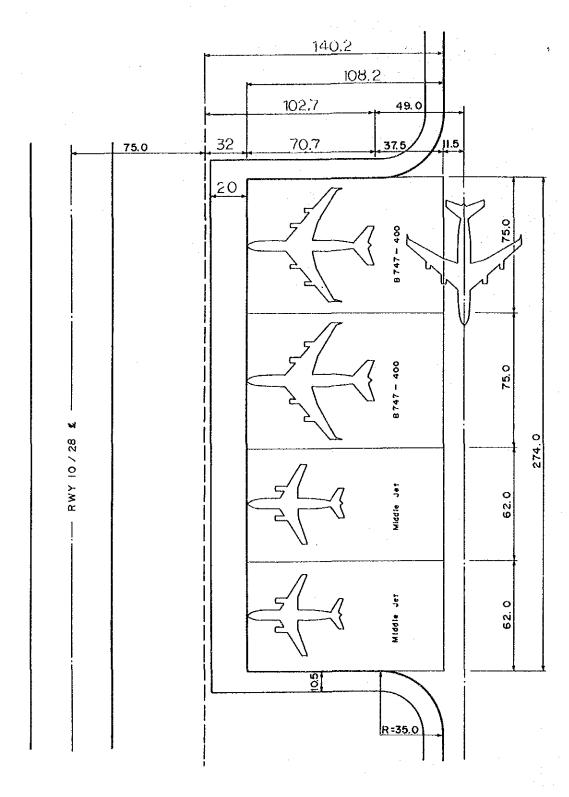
Dimension of New Apron (S-7) $\frac{6-7}{}$
